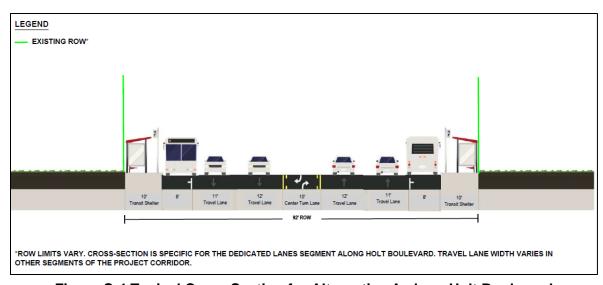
Typical Cross Section for Alternative A along Holt Boulevard
